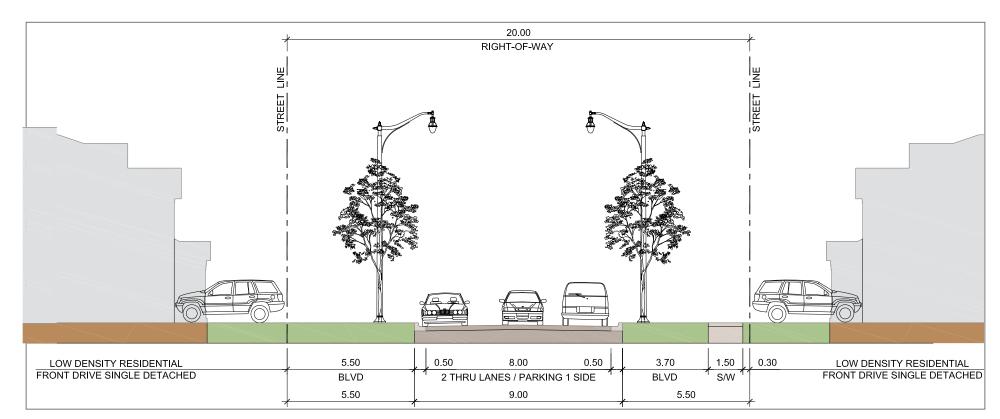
Local Road with Parking - 20.0m R.O.W. Cross-section
